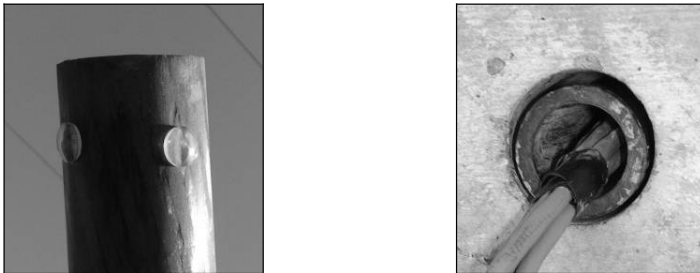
Left: Sandpapered CFRP tube with rubber spacers attached; Right: Inserted CFRP tube with cables from strain sensors exiting
